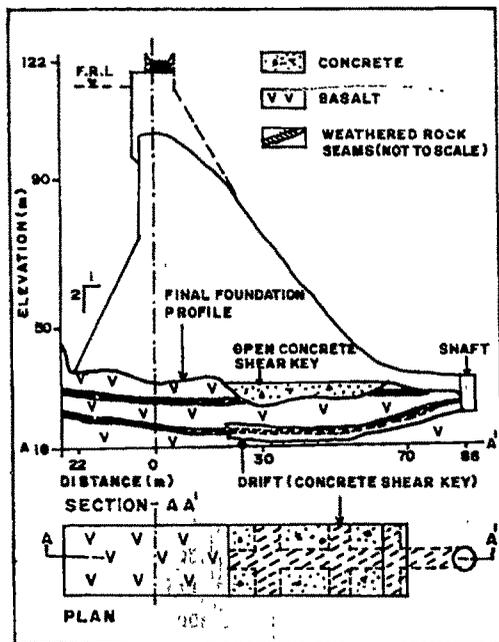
Typical section and plan of spillway block showing foundation treatment of weathered rock seams.
